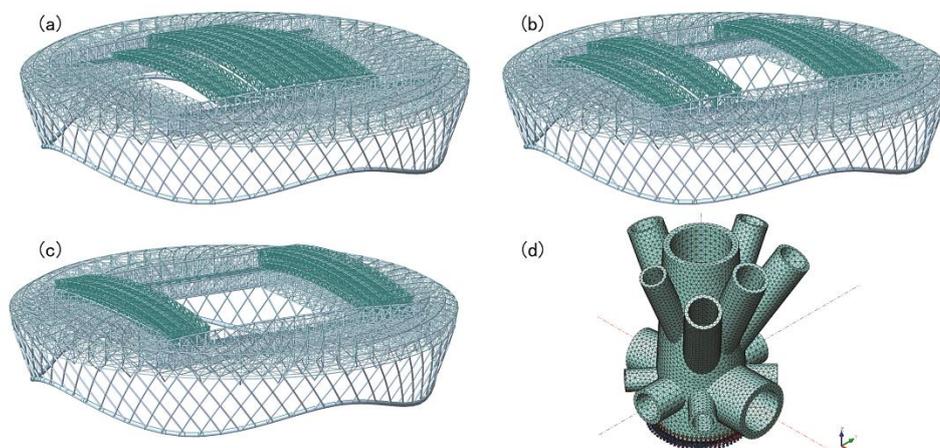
Finite element models developed in this study: (a) simplified truss model of the closed roof configuration; (b) simplified truss model of the semi-opened roof configuration; (c) simplified truss model of the fully-opened roof configuration; (d) meshed solid model of the cast steel node
